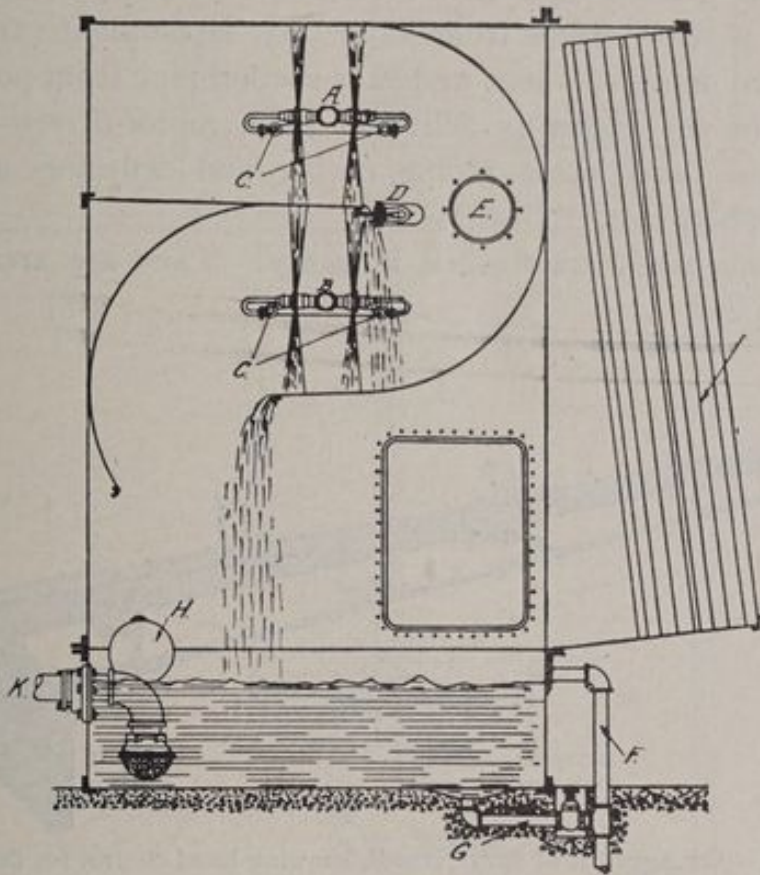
Cross sectional view of McCreery Air Washer and Cooler.
